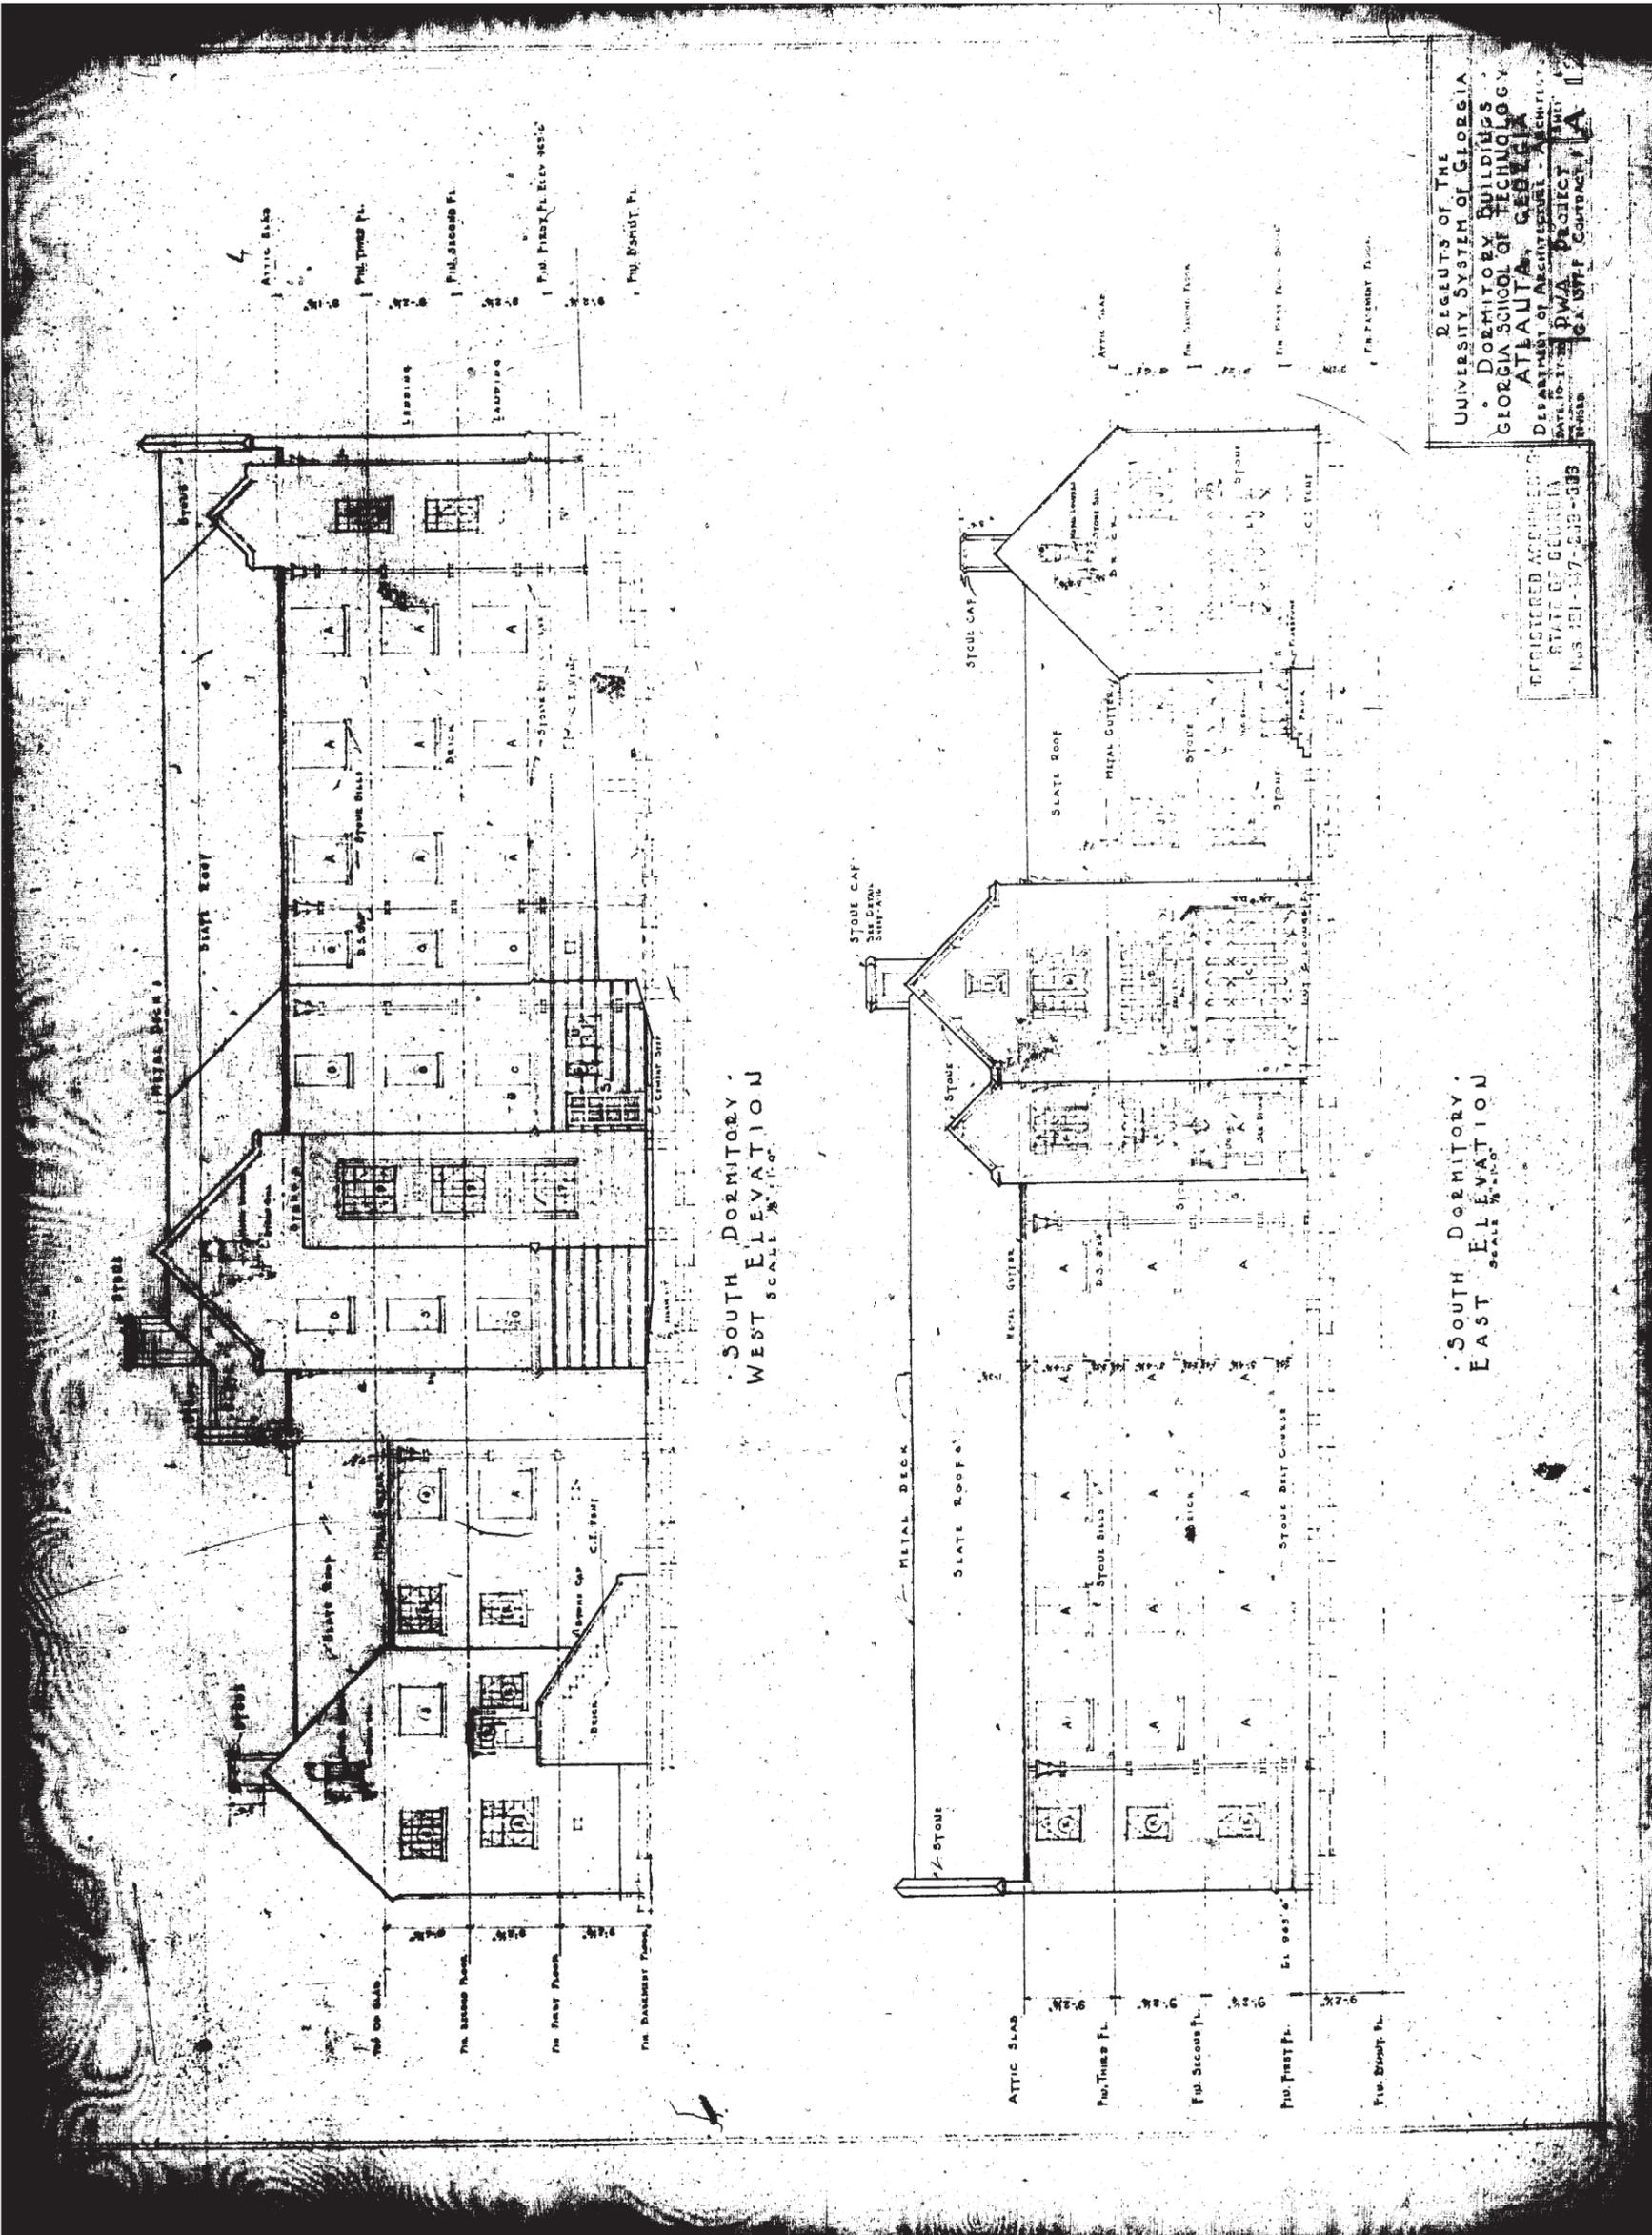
Original 1938 elevation plans for Howell Residence Hall, then known as the South Dormitory.
